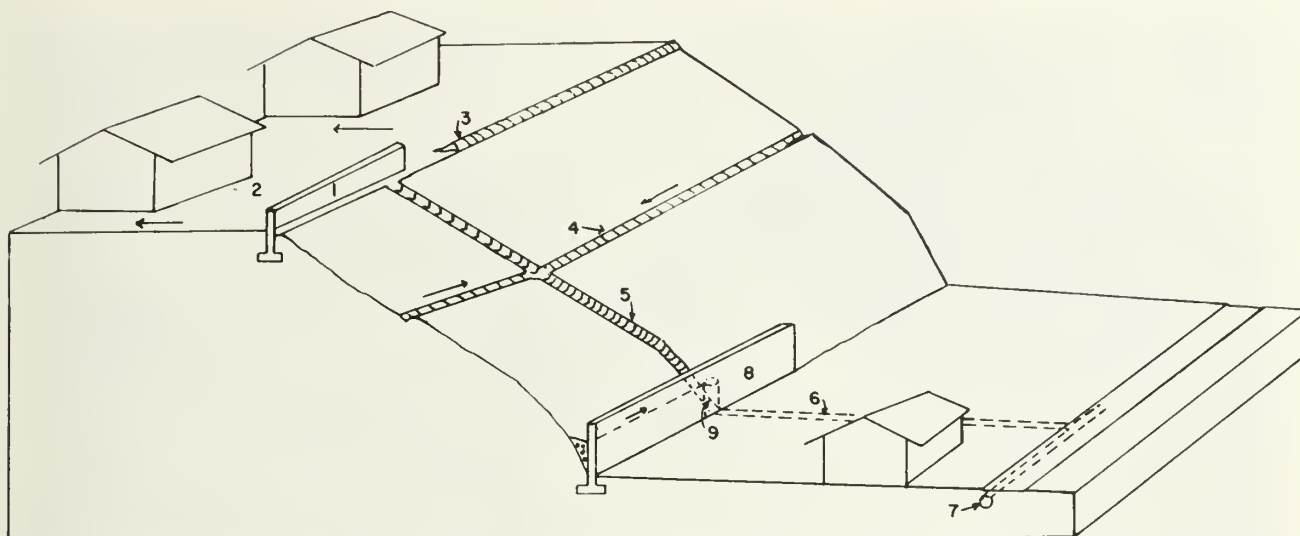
Diagram illustrating measures that can be utilized to alleviate slope instability in the study area: retaining wall (1) may be constructed to protect the property from lateral movement of fill wedge; (2) building pad can be regraded and backyard drainage diverted to street (arrow indicates correct direction of surface drainage); a berm (3) can be constructed at top of slope to prevent water from draining down slope; a bench drain (4) and slope drain (5) can be constructed on the slope to intercept and collect rain water falling directly on the slope surface and to discharge it through an underground pipe (6) into the storm drain along the street (7). A slough wall (8) can be constructed at the toe of the slope to intercept debris flows. Compacted fill should be placed behind the wall and graded so that flow (see arrow) is diverted into a drain-pipe (9) that feeds the outlet pipe (6). (Not drawn to scale.)
